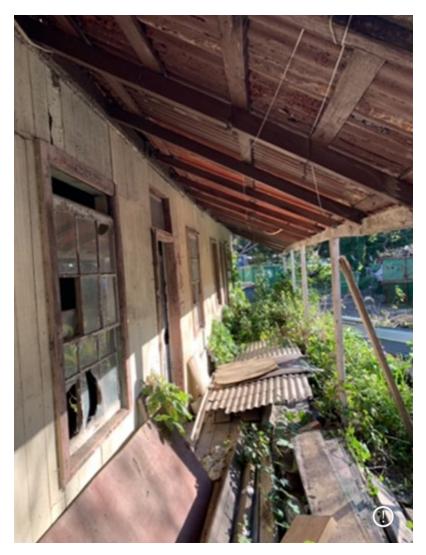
Verandah of single storey component of Denmark Hotel – to be incorporated as part of Unit 2 POS area
